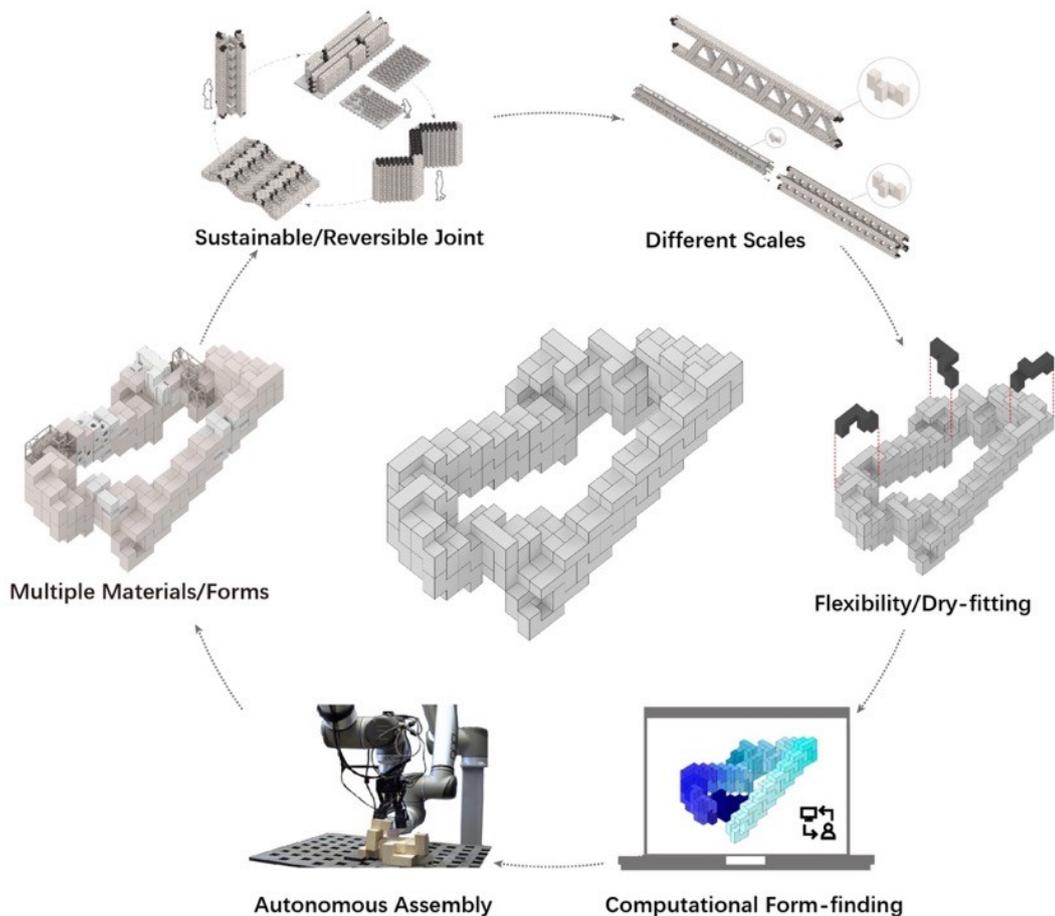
The properties of the investigated building elements, the robotic assembly, and the computational design tool
